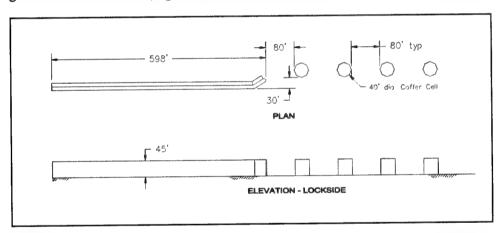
Four circular sheet pile cells placed downstream of lower guard wall
